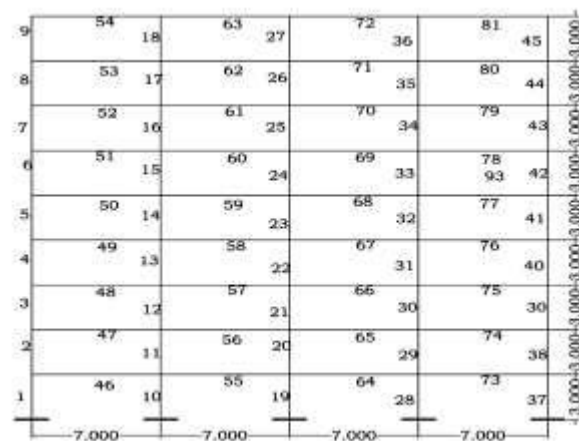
Elevation of 9-storey steel MRF 6 & 9 floors each 3.00m and four bays each 7.00m respectively
